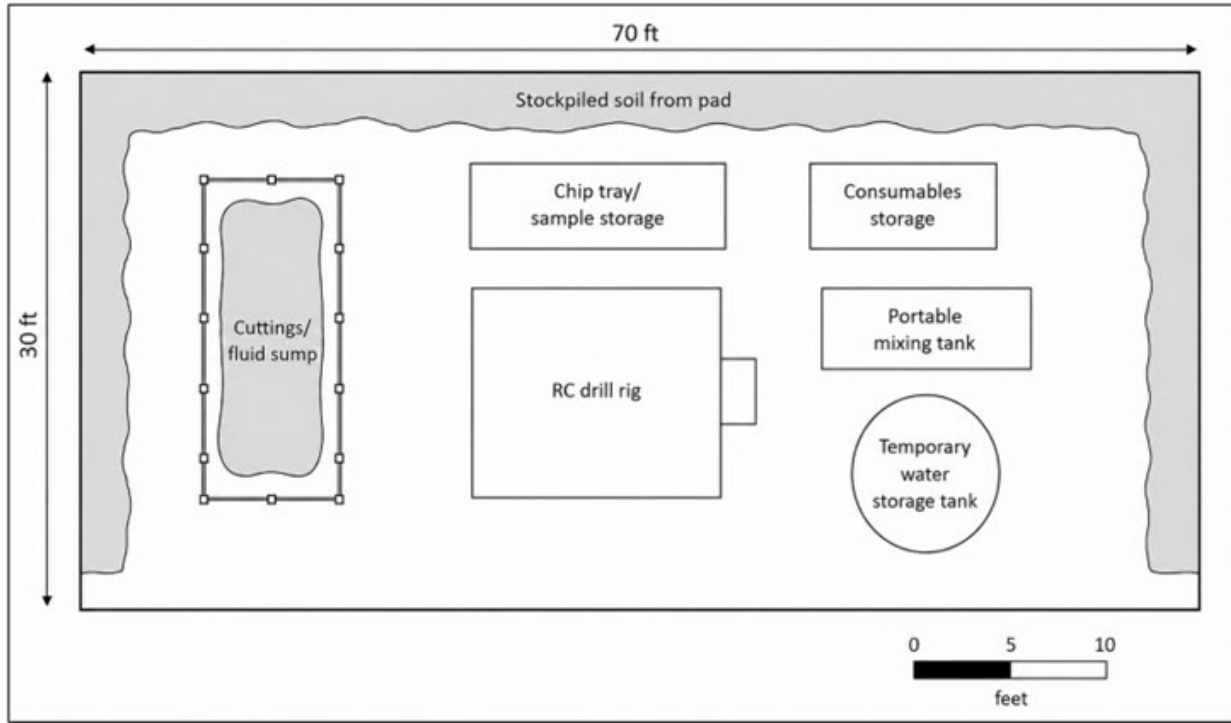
Typical Drill Pad Layout. Typical layout for a proposed 70-foot by 30-foot drill pad, including the in-pad sump, temporary sump fencing, water tank, stockpiled soil/topdressing, and approximate equipment arrangement. The layout depicts the general organization of drilling-related features within a pad footprint; final equipment placement may vary slightly based on site conditions, provided disturbance remains within the authorized pad boundary.
